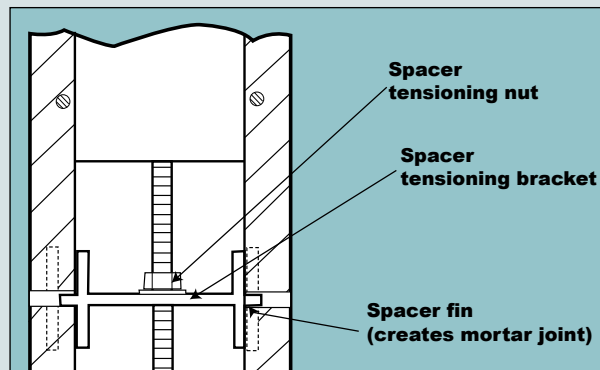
End cross-sectional view through the cavities of two stacked wall units incorporating the combination spacer/tensioning assembly.
